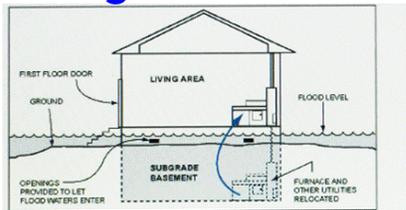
Wet floodproofing with a wet floodproofed subgrade basement (Source: FEMA 512)
